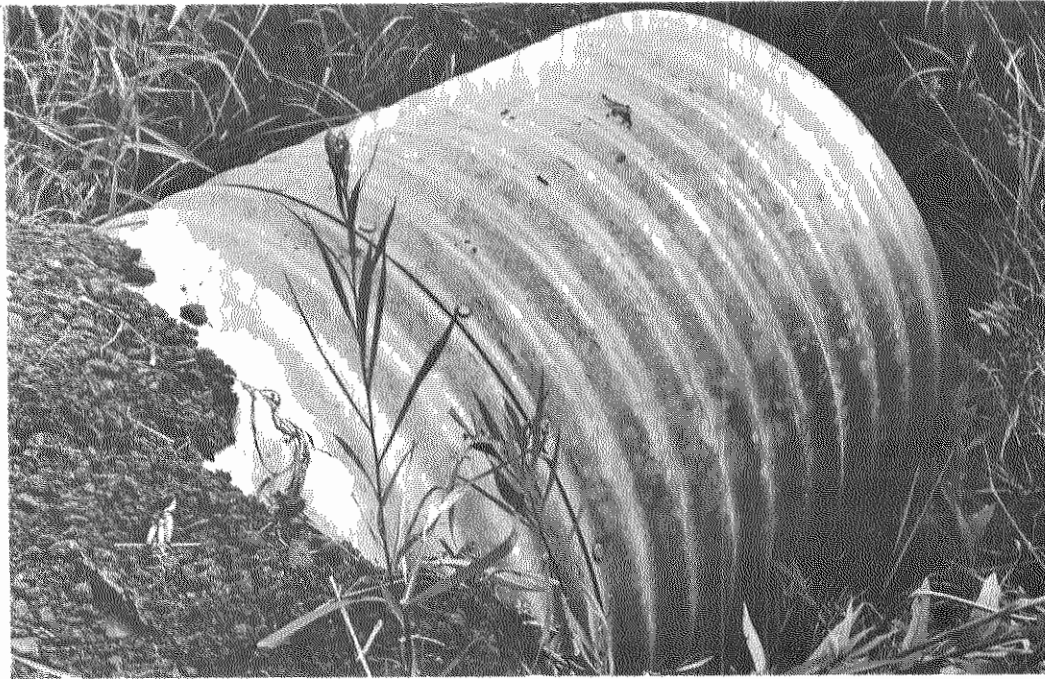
Aluminum culvert, Bessemer (exvert). Spotted or blotchy appearance typifies the superficial corrosion referred to as white stain or etch.
